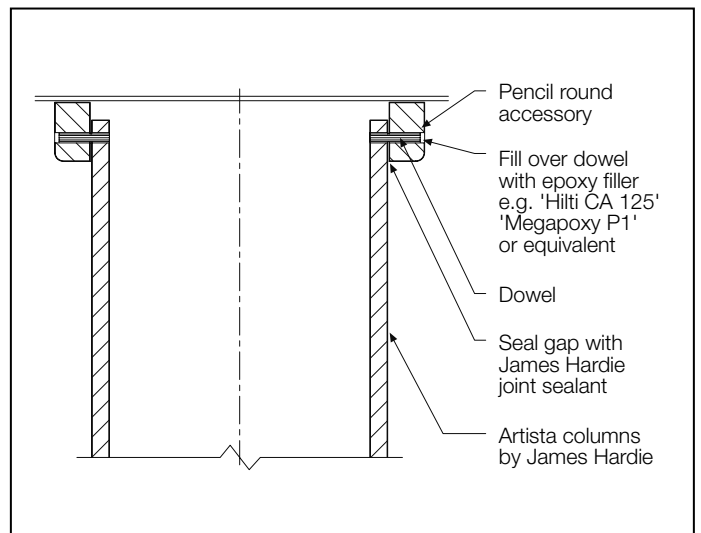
ACCESSORY FIXING DETAIL - USING DOWEL
